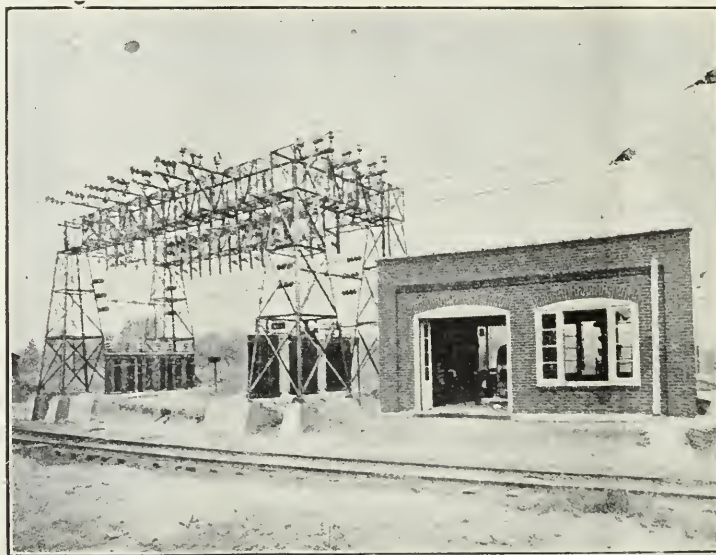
Railway Sub-station with Outdoor Hornbreak H.T. Switchgear.
